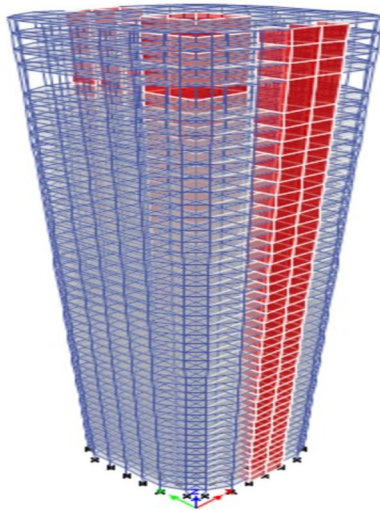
Soft Storey at 42nd floor (storey 42) without LRB
